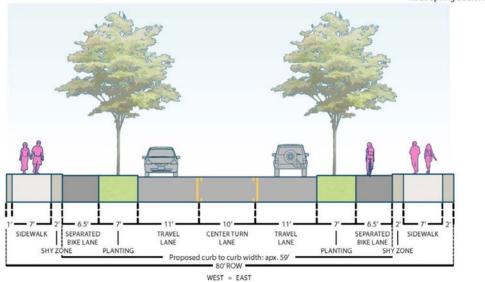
Rockledge Drive Cross Section from Rock Spring Sector Plan Design Guidelines
